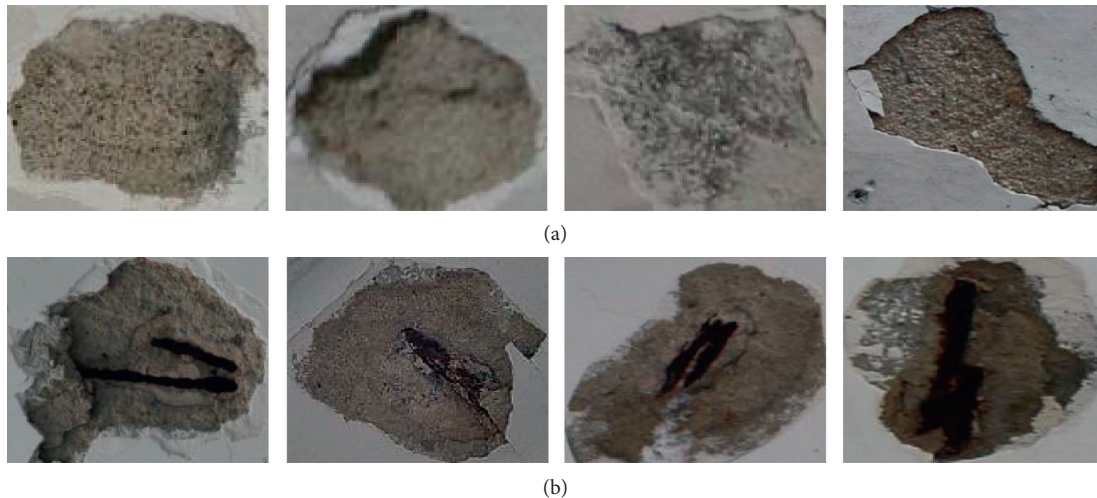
Appearances of spall in reinforced concrete surface: (a) shallow spall and (b) deep spall.
